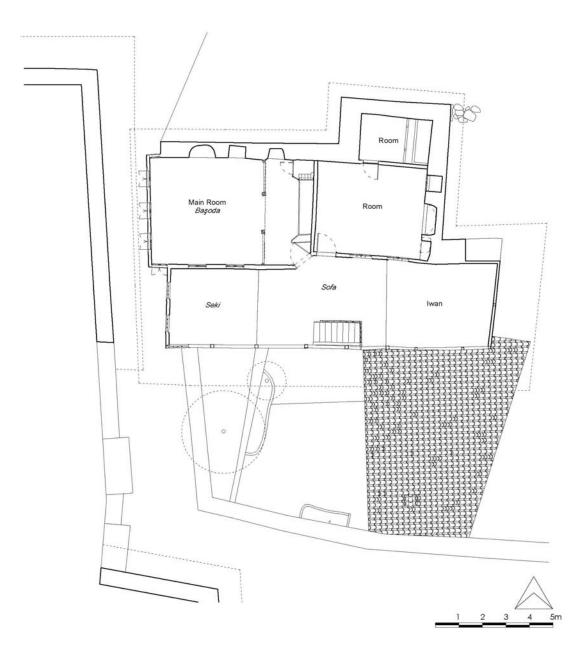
The plan of the first floor of Kaçıklar House. (Source: Kenar et al. 2019)
